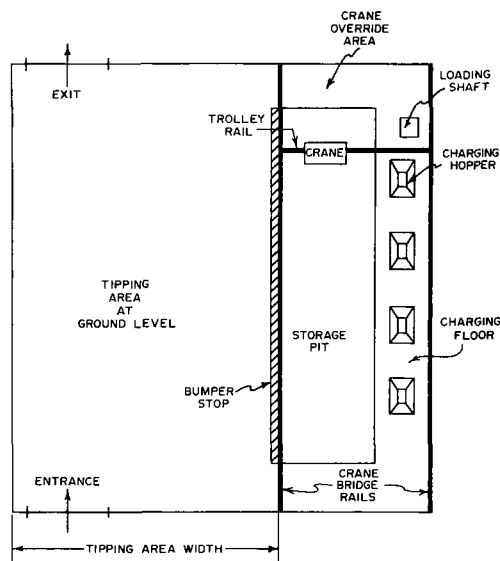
PLAN OF TIPPING AREA AND STORAGE PITS WITH CRANE
